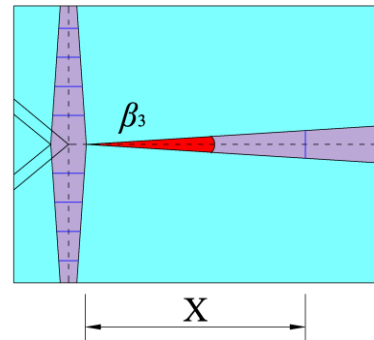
Rebar extension in horizontal yield-line crack  $\beta_3$
